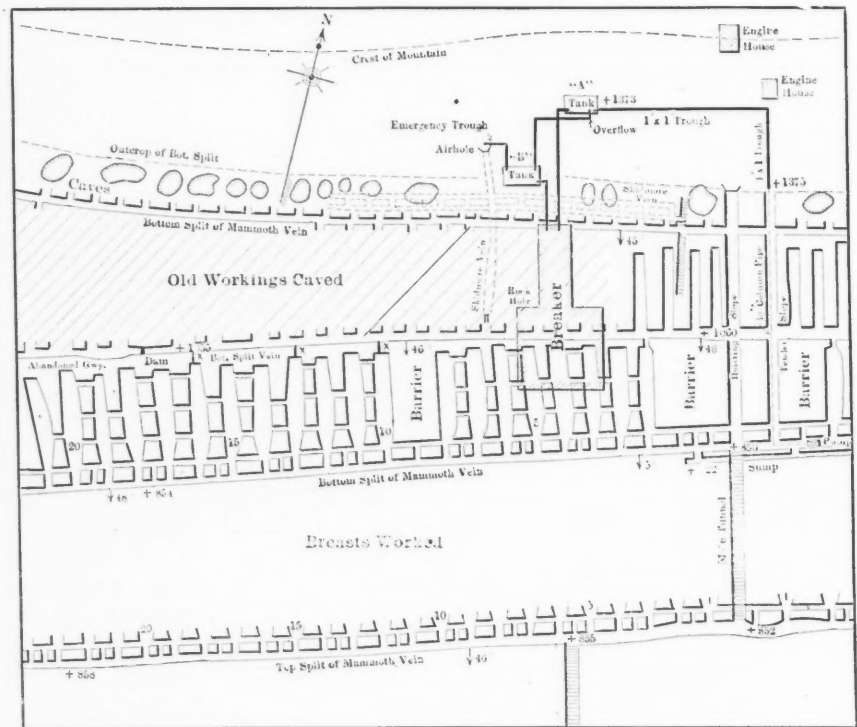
SHOWING ARRANGEMENT OF TANKS AND LOCATION OF DAM AND DRILL HOLES
